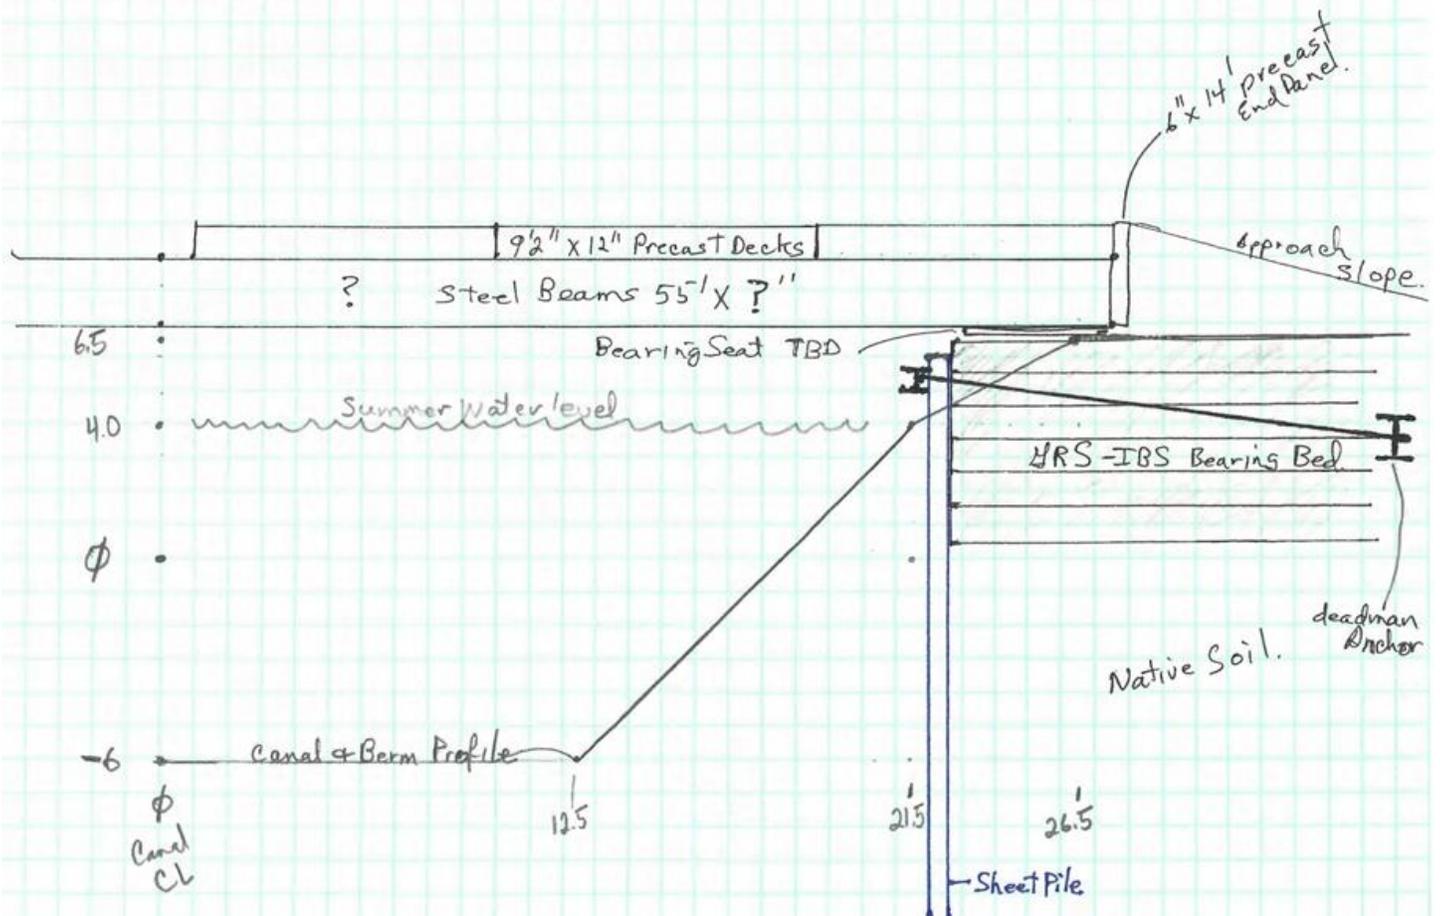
Beaver Slough Drainage District bridge design for access road to tidegates.
